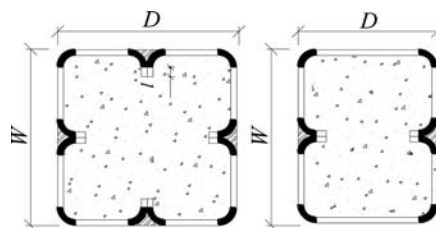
Stiffened sections built up by welding cold-formed lipped section.
